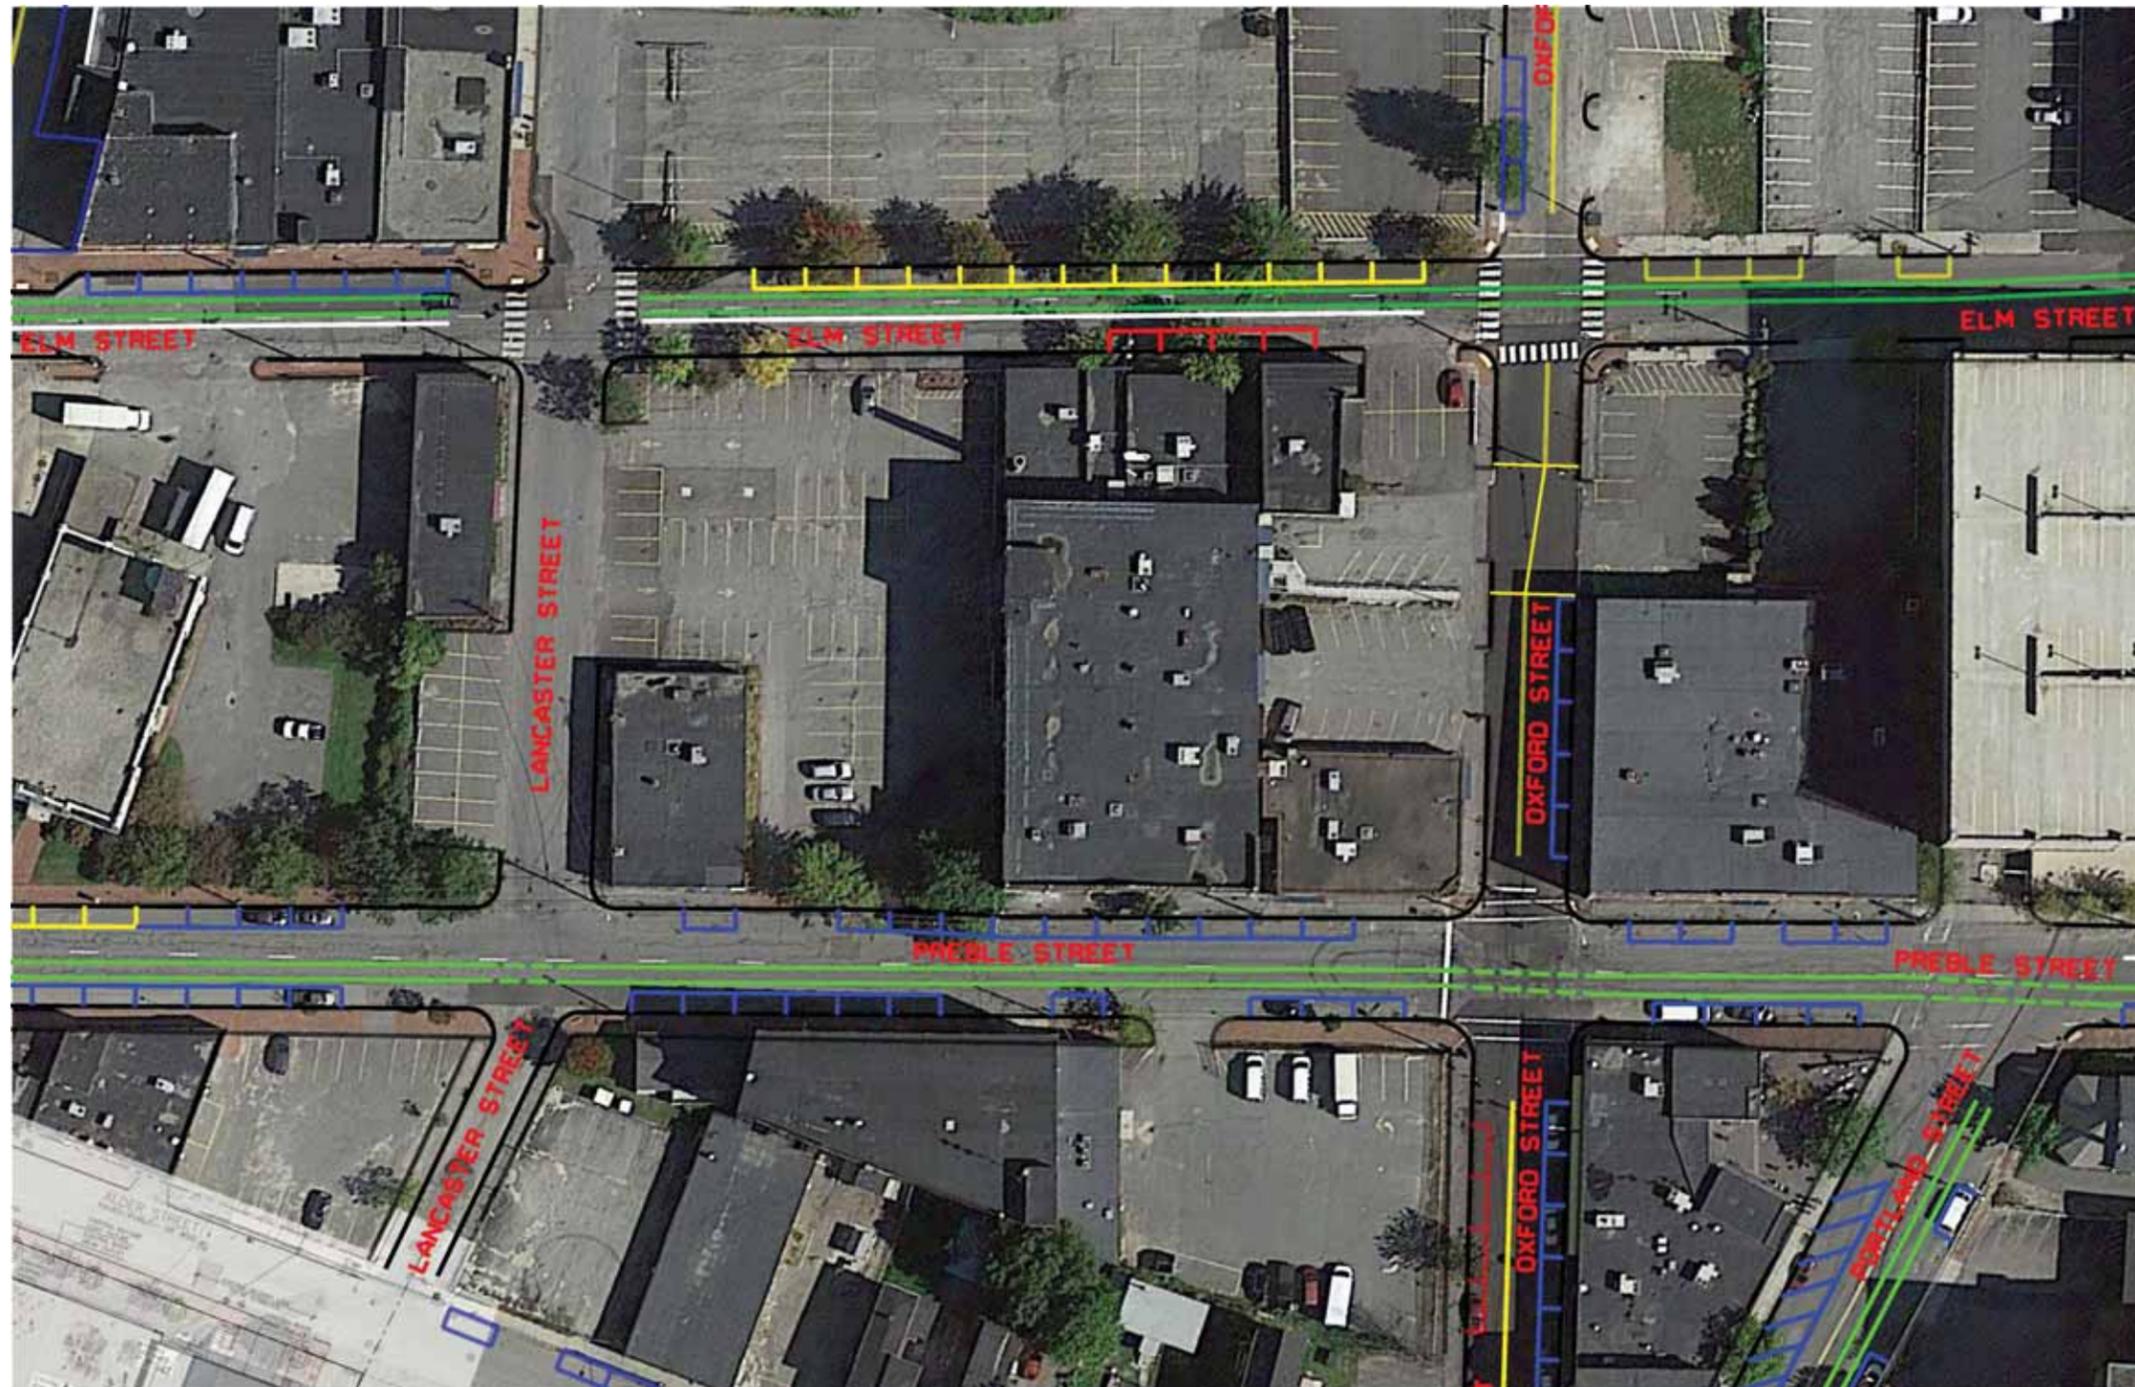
Section 2 of 3 – Preble and Elm Street - Long Term
